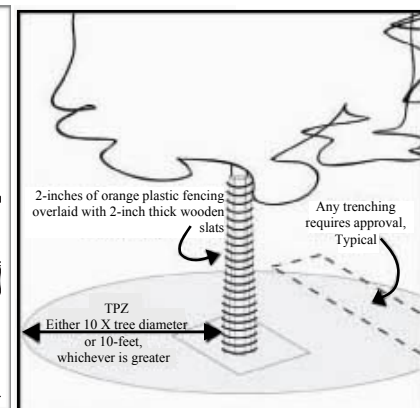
Type III Tree protection with trunk protected by a barrier to prevent mechanical damage. Image City of Davis.
